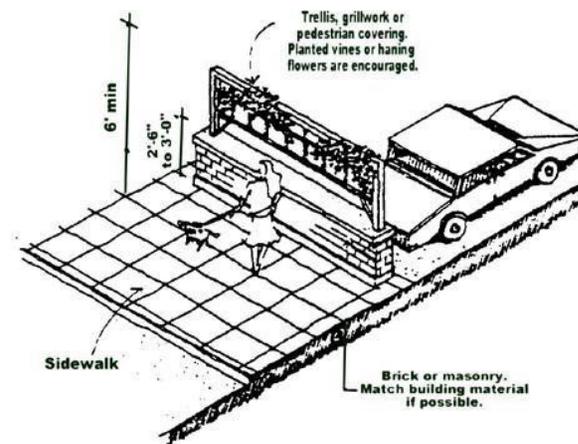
Low wall with trellis above hanging plant is ideal as a screening element for parking lots.
